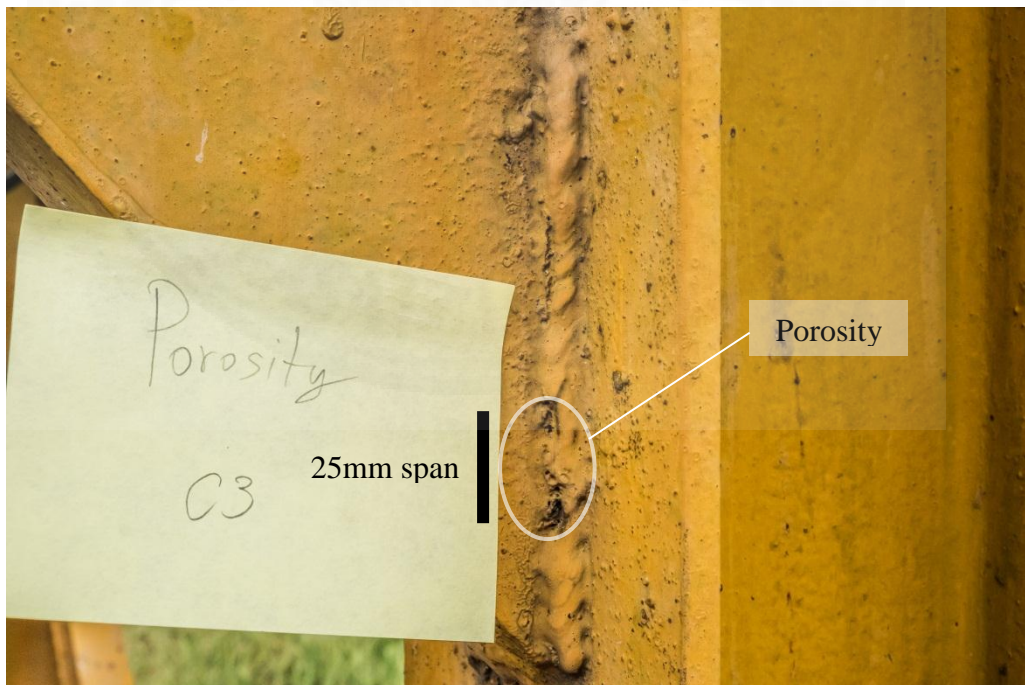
Welding defects on Billboard A (joint 5)
